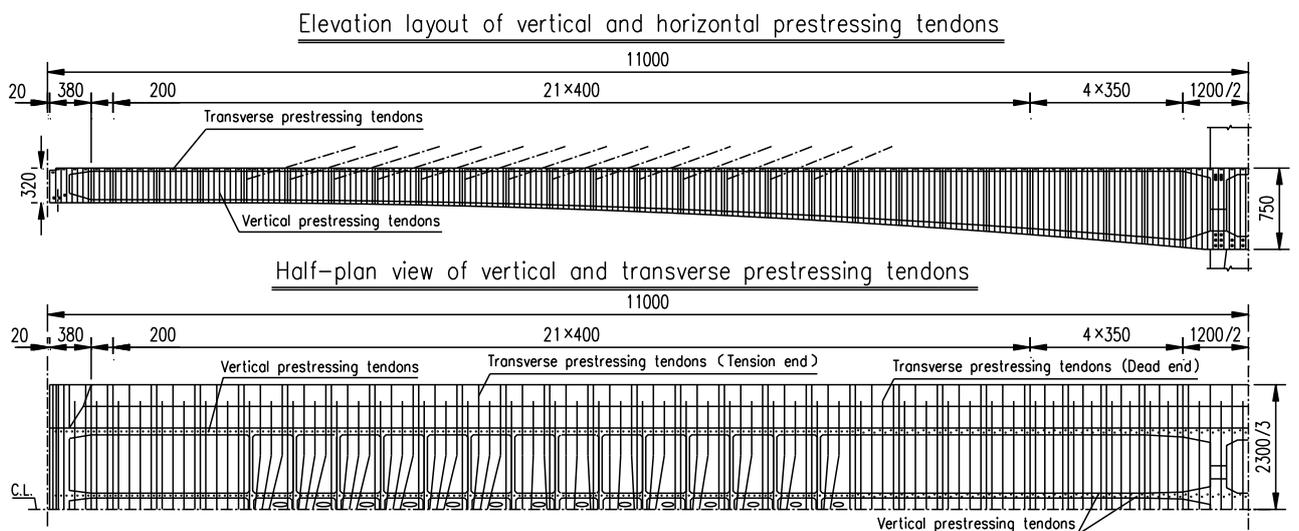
Layout Diagram of Transverse and Longitudinal Prestressed Tendons in the Girder (Side Span) (Unit: cm)
